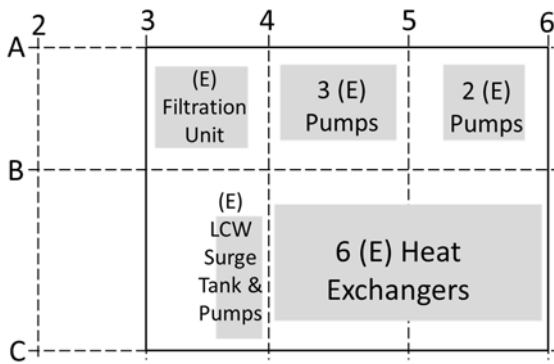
Equipment Layout on 2nd Floor: Existing (E) Conditions (Bascoul et al. 2017)
